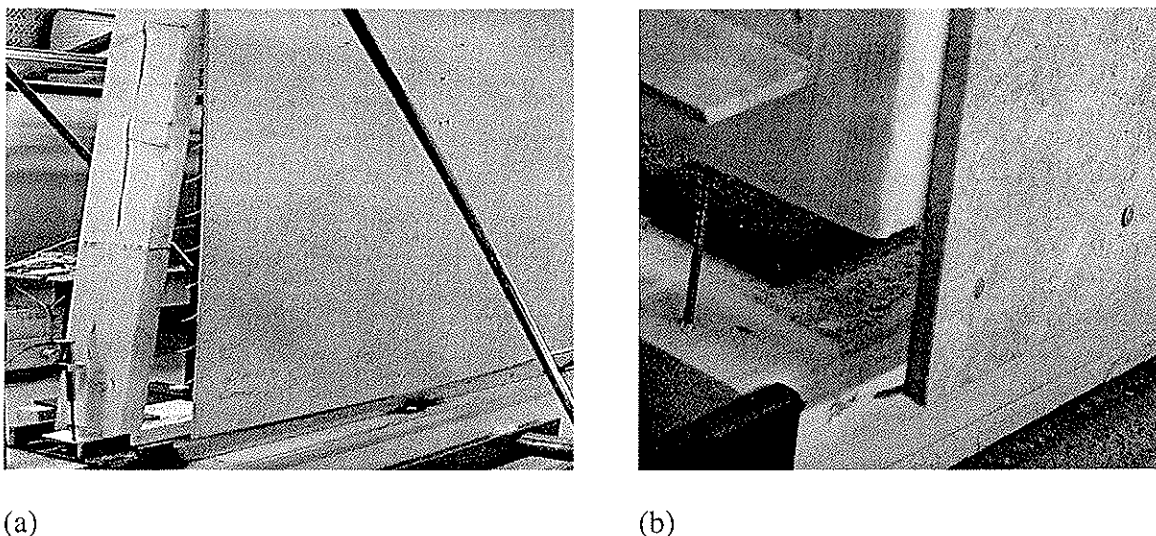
(a) Failure of the sheathing-to-timber joints for a shear wall with boundary and loading conditions according to Figure 1a; and (b) Uplift of the leading stud and failure of the sheathing-to-timber joints for a shear wall with boundary and loading conditions according to Figure 1b and with $V = 0$.
